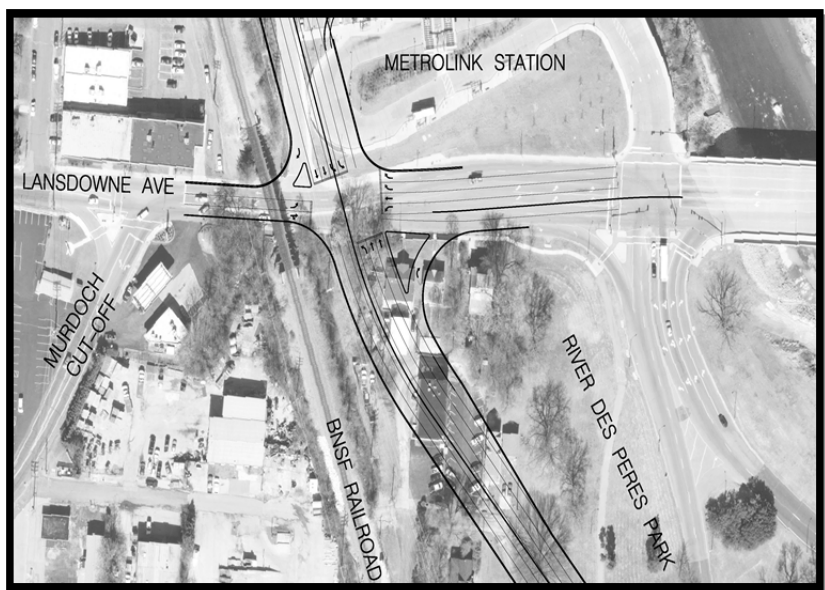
Lansdowne Avenue Intersection – At Grade
